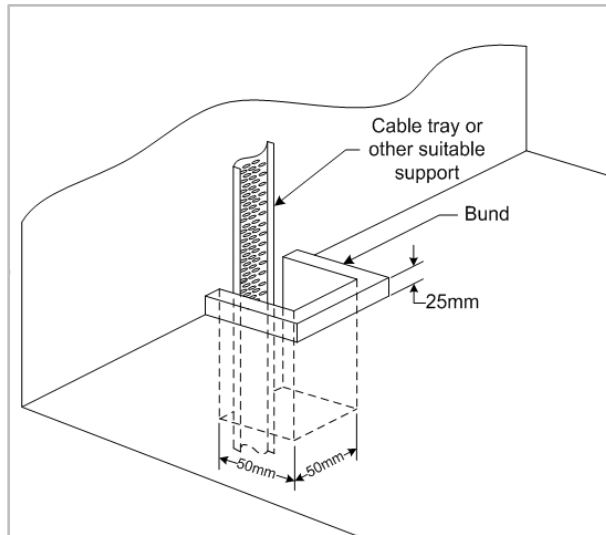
Slot example telecommunications riser/closet floor or ceiling entry
